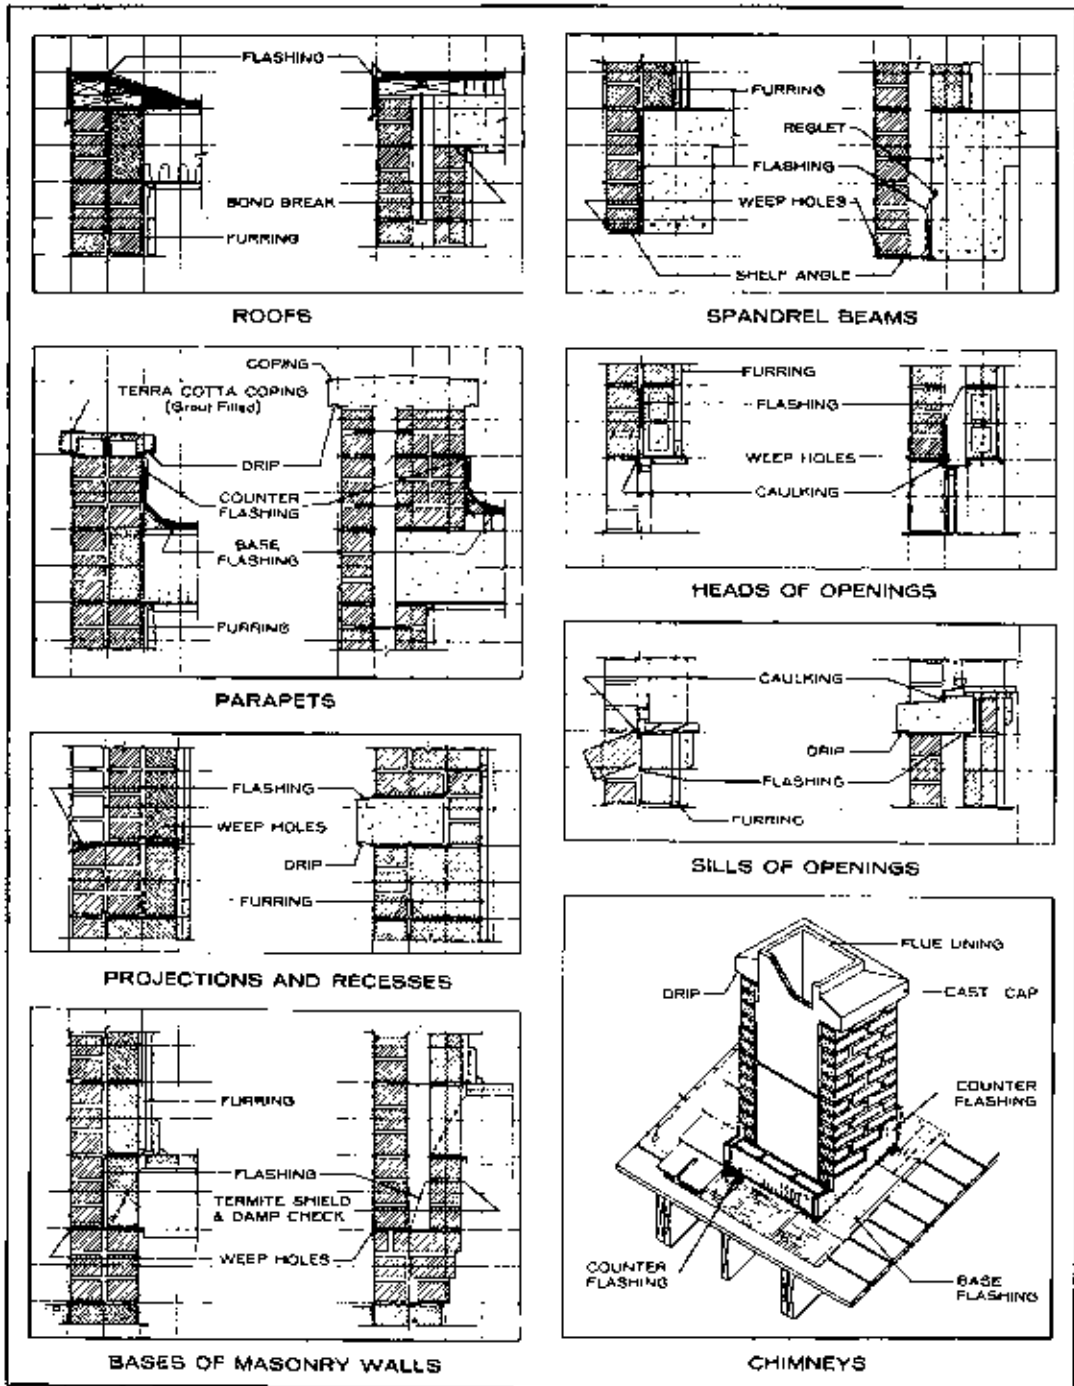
Flashing used in brick masonry construction. (Courtesy of The Brick Industry Association)
